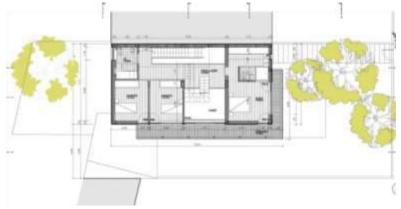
House in Miramar 348 Arquitectura, Portugal, plan
